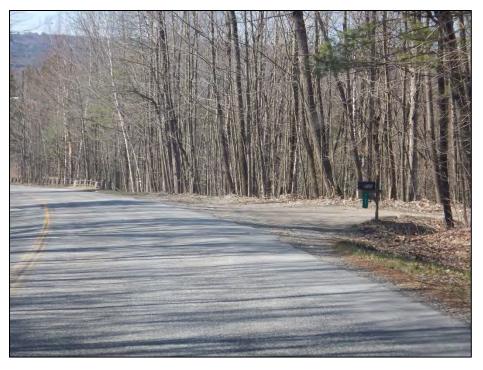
Photo shows a driveway on the west side of Jericho Road. View is to the south.
